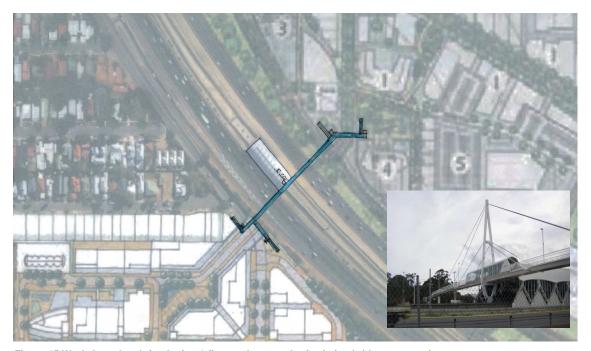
Workshop sketch for Option 1 (Inset: photograph of existing bridge structure)
